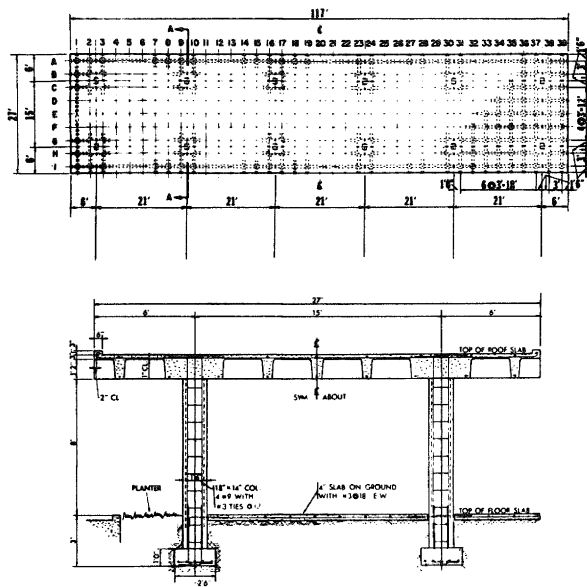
ROOF FRAMING PLAN AND SECTION A-A OF AMBULANCE CANOPY
